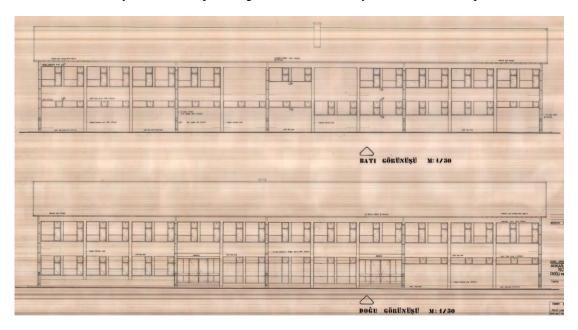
Construction drawing of the dining hall, the west and east elevations, İsmet Şen Construction Company, 22.10.1976 (Source: TTA Archive)
